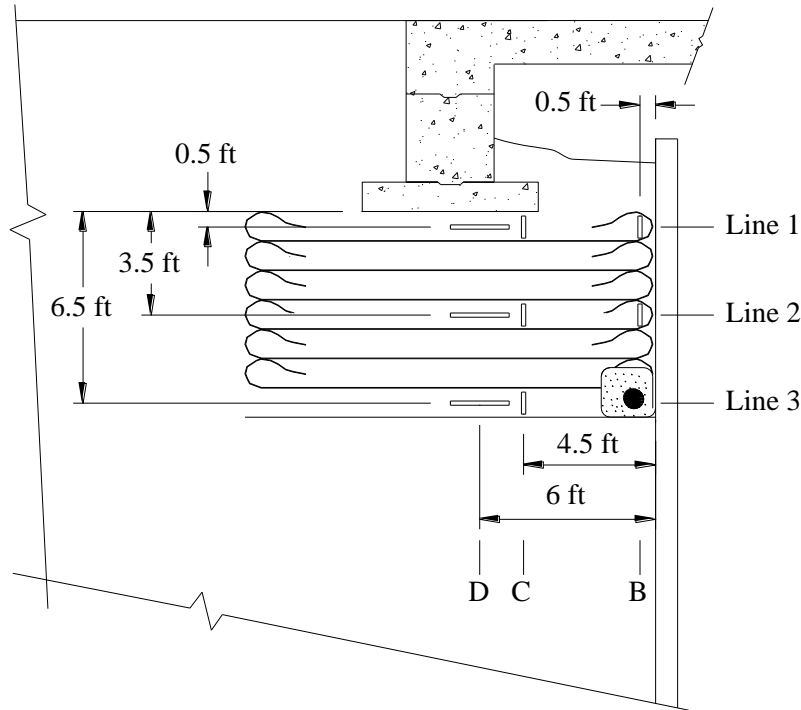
Location of earth pressure cells in west sheet pile abutment system in BC, Iowa
